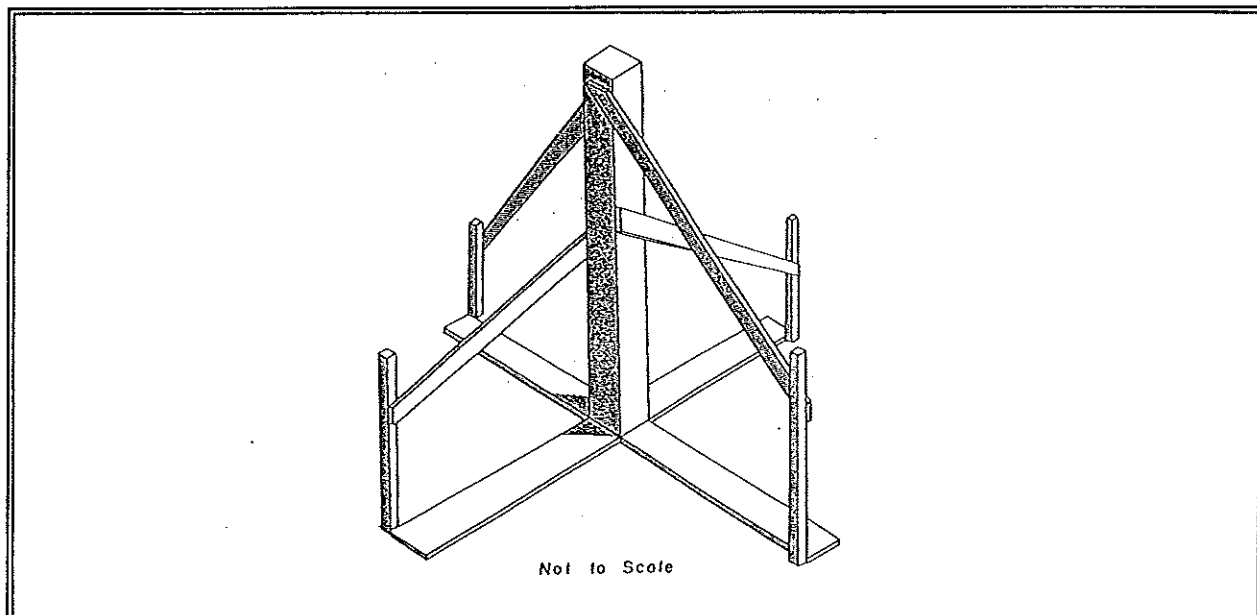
Reconstruction of the subterranean support system of the flagstaff base at Fort Larned, Kansas (Hunt 1983).
